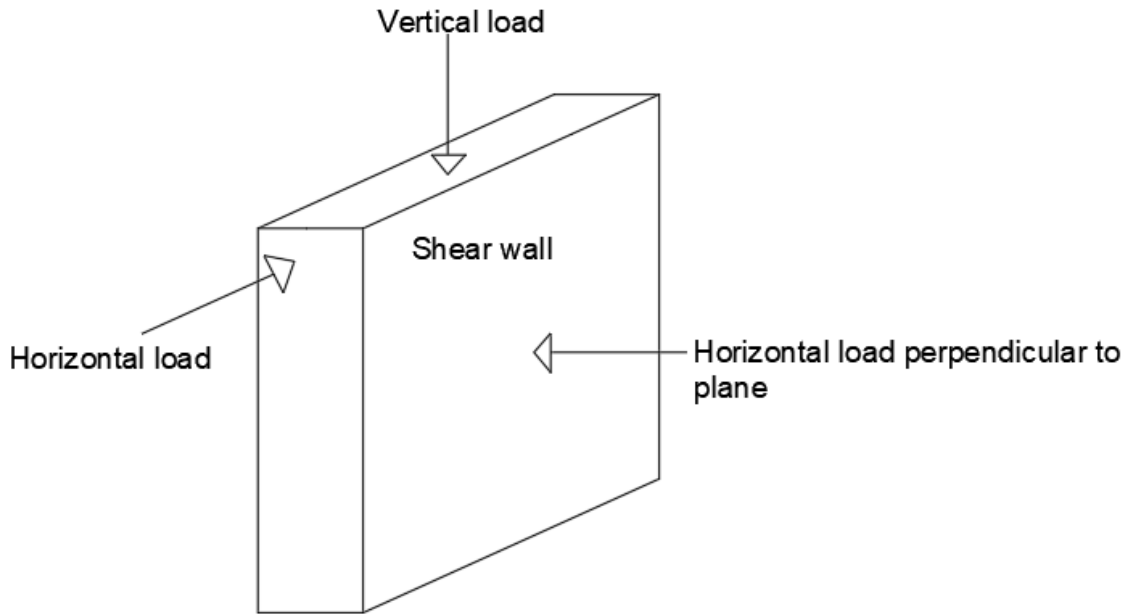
Shear wall subjected to horizontal load, vertical load and horizontal load perpendicular to its plane.
